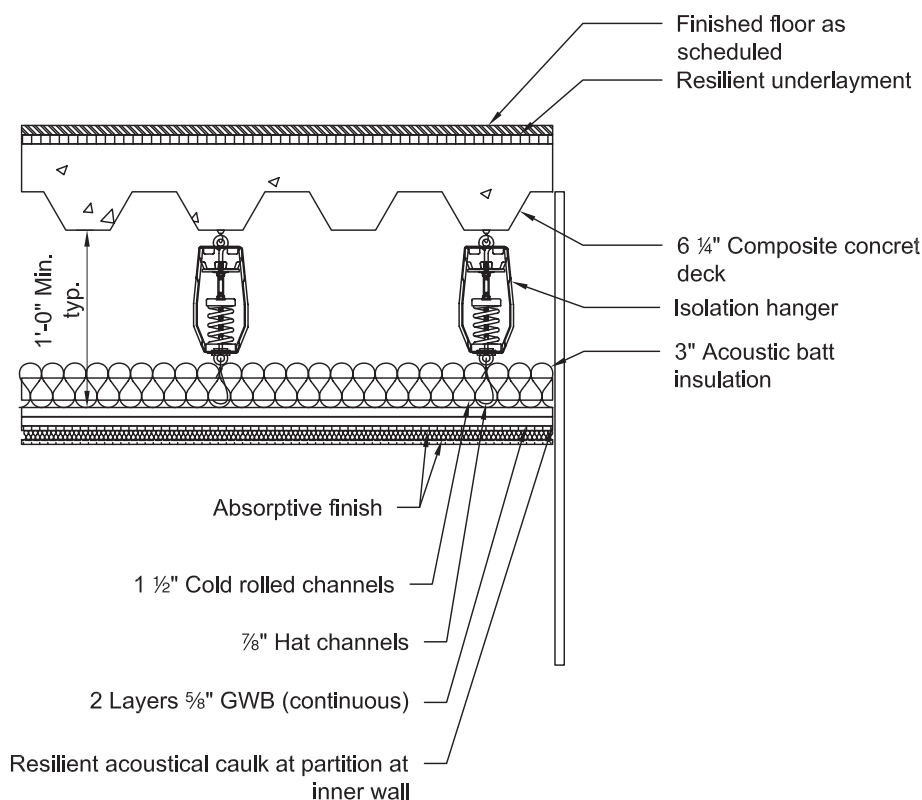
Composite metal/concrete deck with spring ceiling hangers, sound-absorptive ceiling finish and floors on a resilient underlayment.
